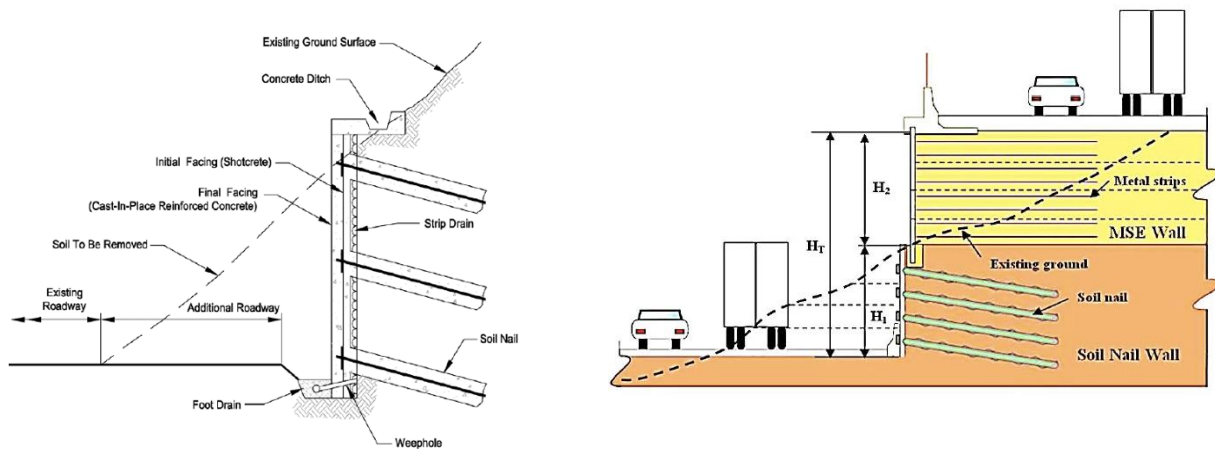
Example applications of soil nailing: (Left) roadway cut (modified after Porterfield et al. 1994); (Right) retaining wall (Wood et al. 2009).
